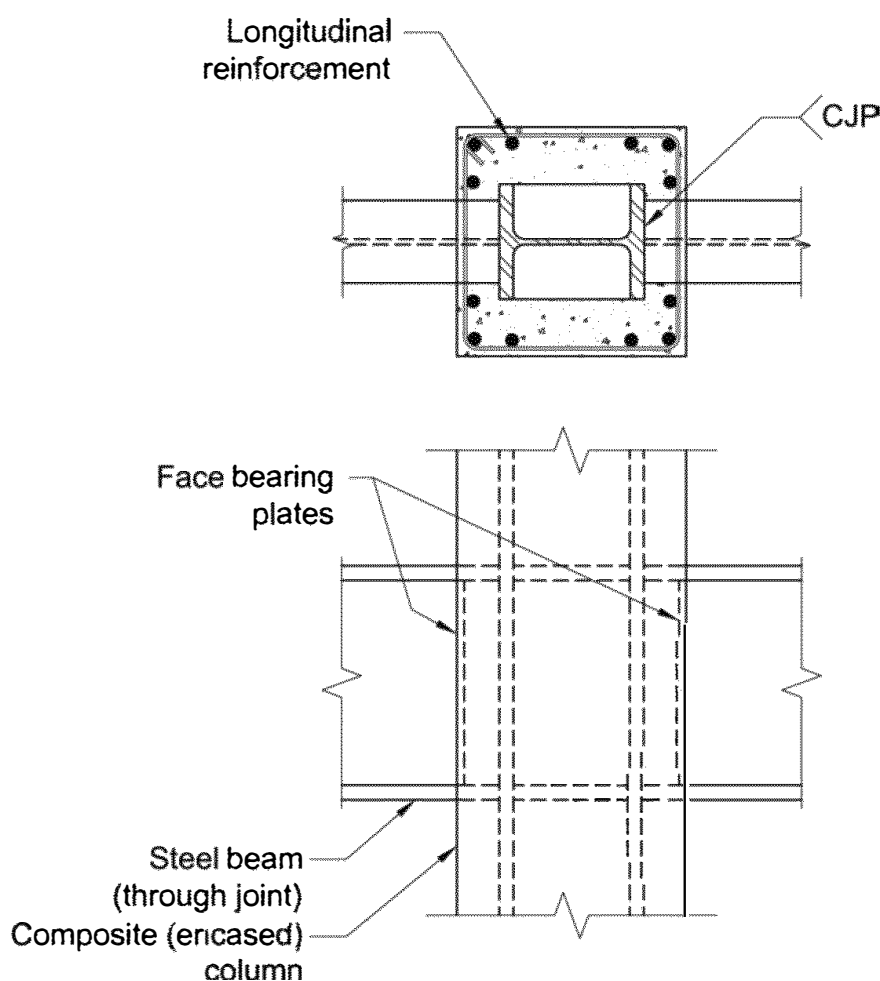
Encased composite column-to-steel beam moment connection.
